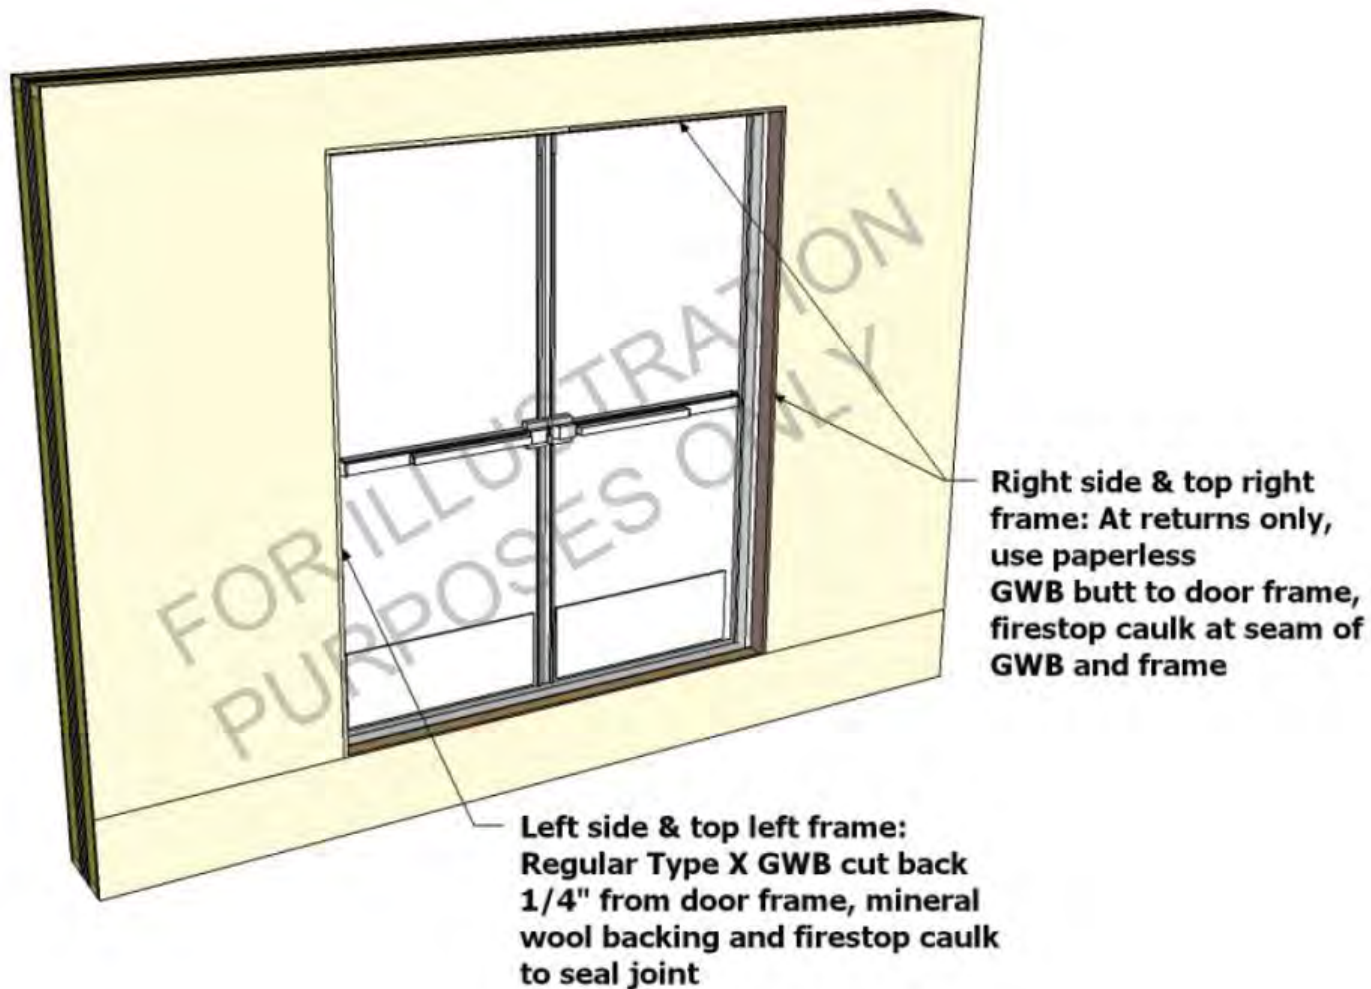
Type X gypsum wallboard over framed wall and with allowance around perimeter of opening for fire caulking
